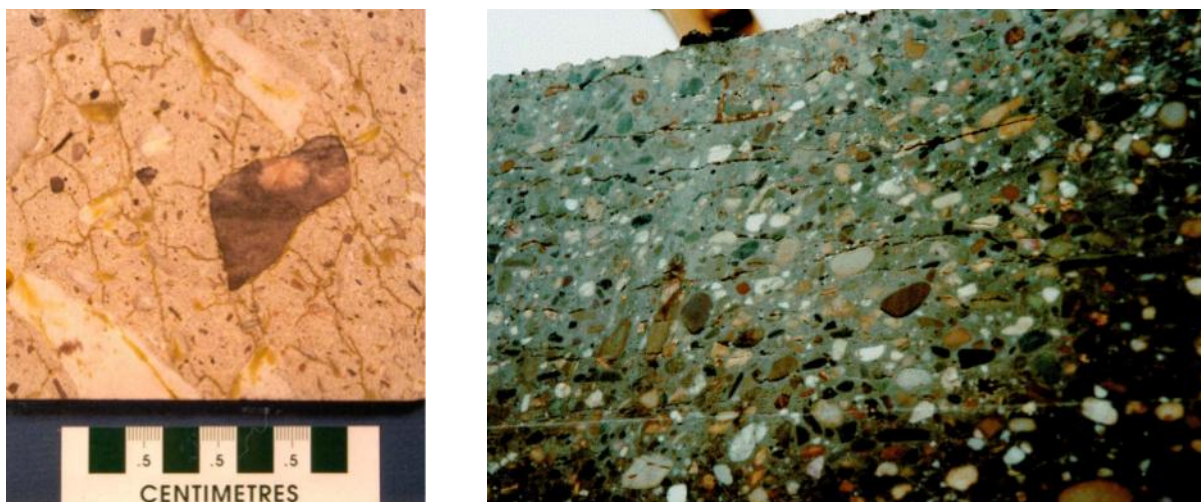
Thin and isotropic cracks (highlighted with epoxy impregnation) in ASR damaged dam concrete (left) (from Rivard and Saint-Pierre, 2009) and extensive internal cracking in a vertical cross-section of a concrete bridge deck (right) (Bakker and Postema, 2003).
